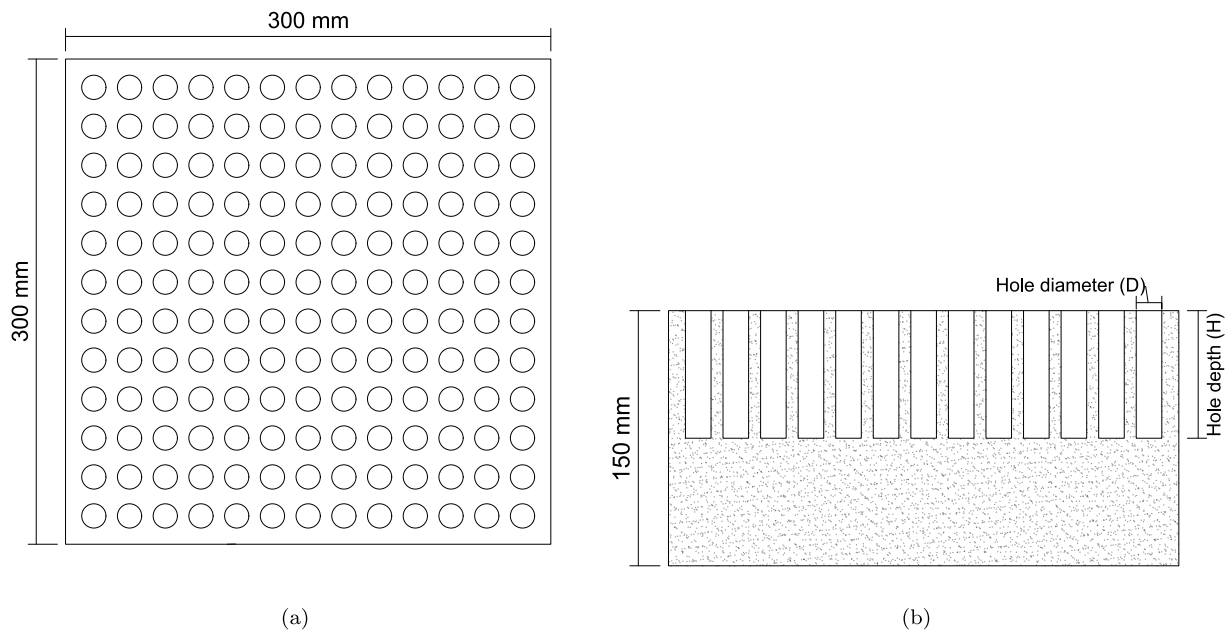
Drawings of SPM: (a) plan view and (b) side view.
